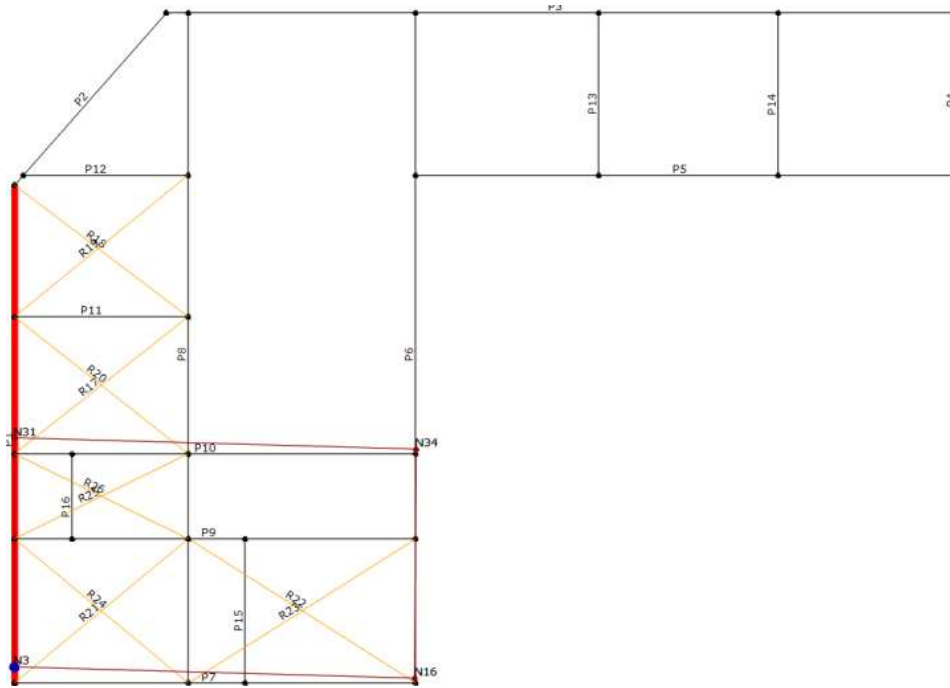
Plan deformed shape for Y direction after reinforcement
